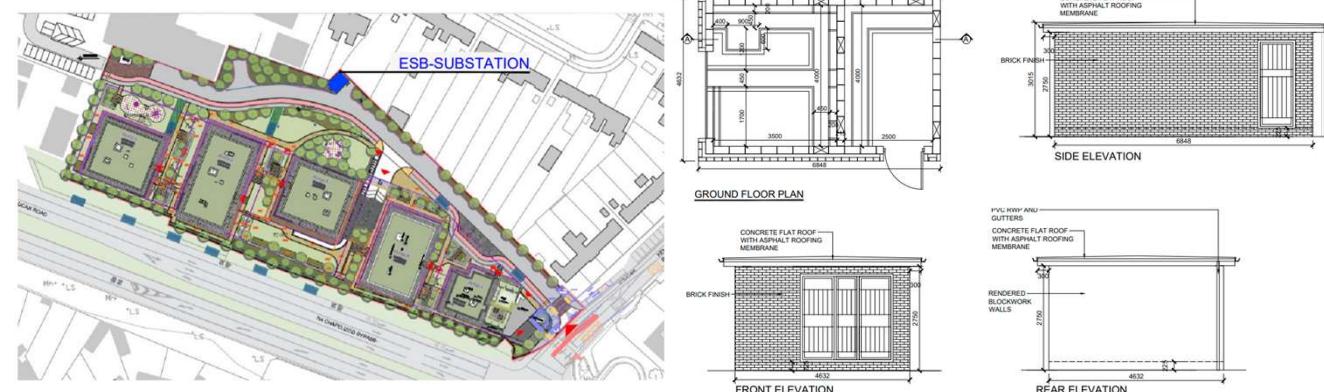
ESB – Substation Location, Floor Plan and Elevations – Extracted from Existing Scheme
